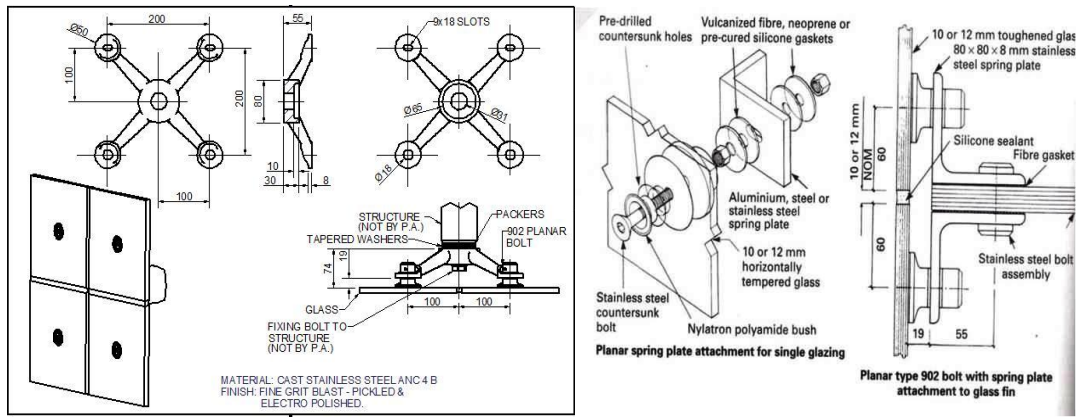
Planar Glazing System of Spider Bracket Connection in Structural Glazing Curtain Wall Type (12 Construction Detail- High rise 2008)
